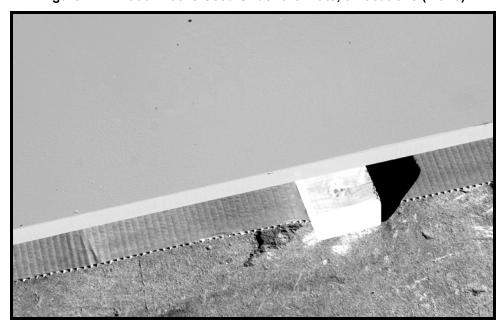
Wood Blocks Used Under the Plate, 3 Locations (2 of 3)
